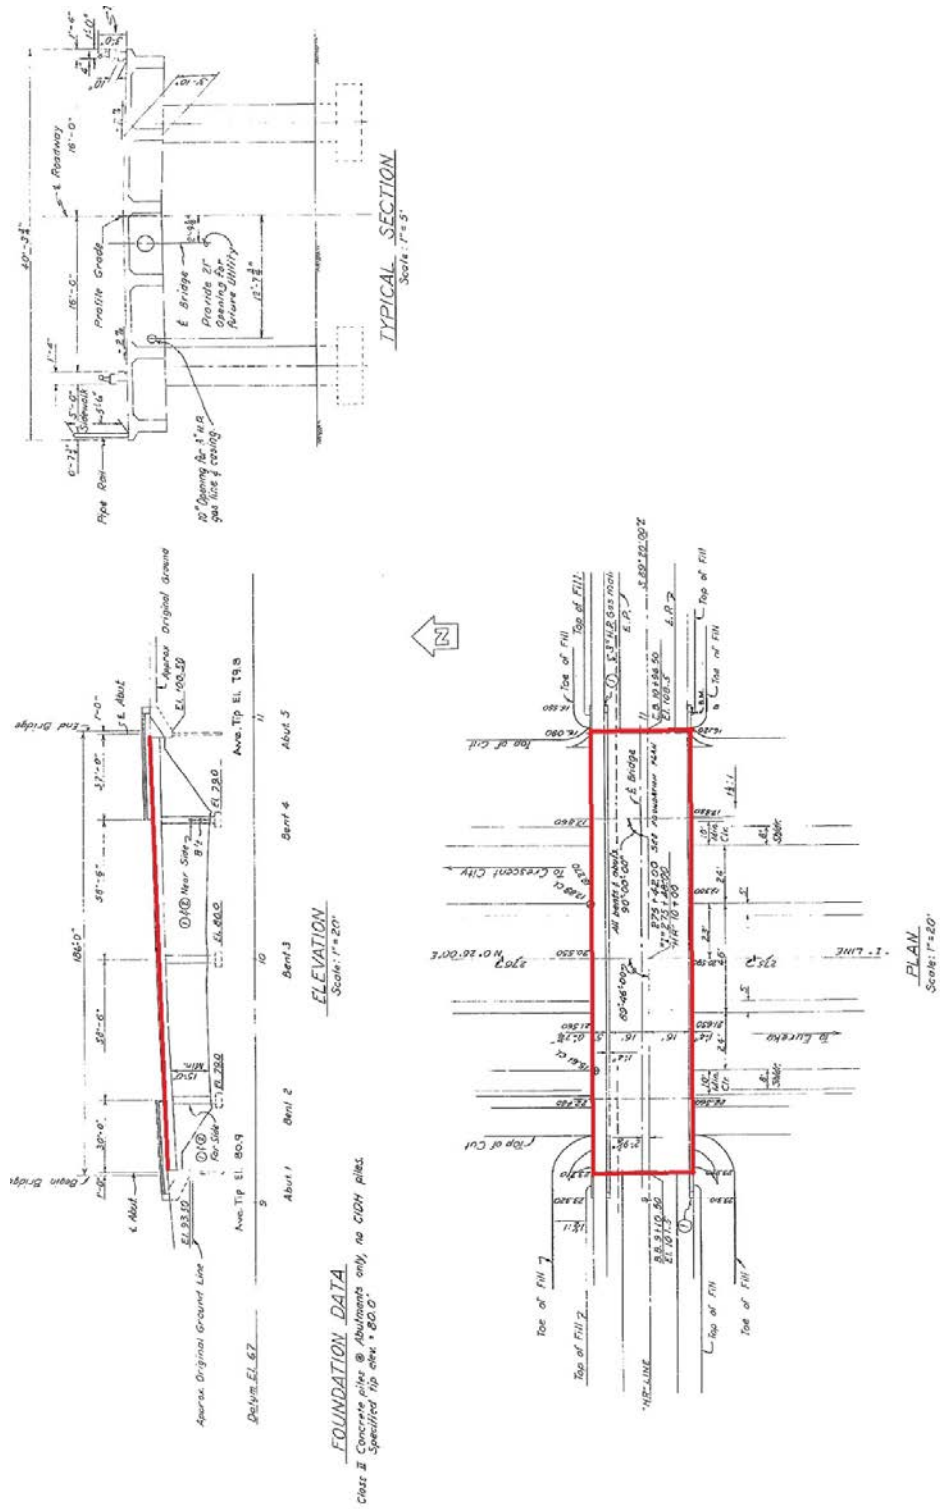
Hiller Road Overcrossing Elevation and General Plan, After As-Built General Plans, 1965.
